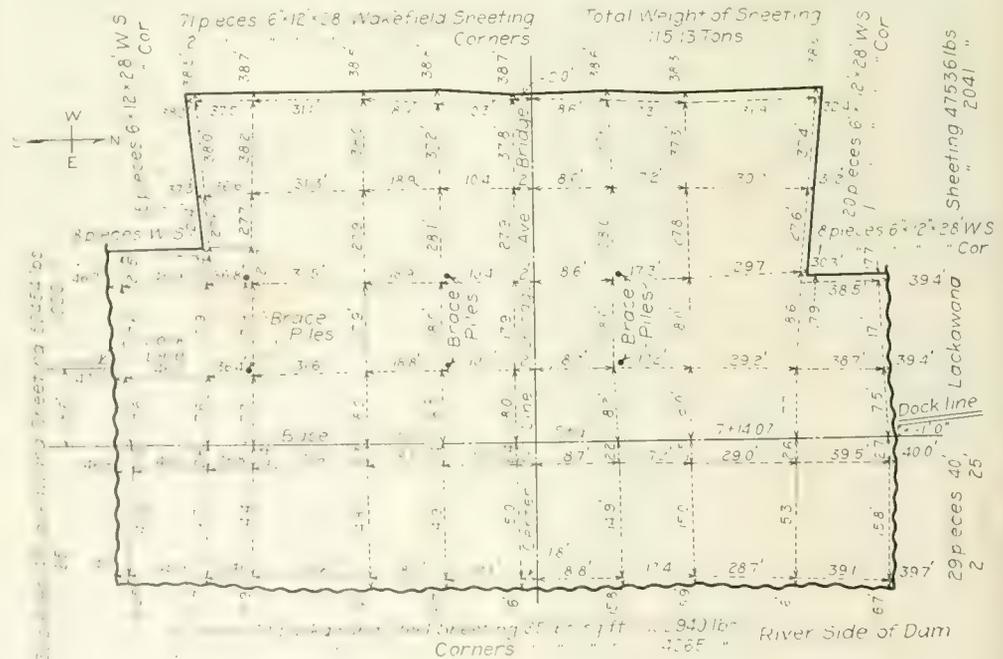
Plan of West Cofferdam and Bracing for Piers of Chicago Ave. Trunnion Bascule Bridge, Chicago, Ill., Showing Dimensions and Construction.
